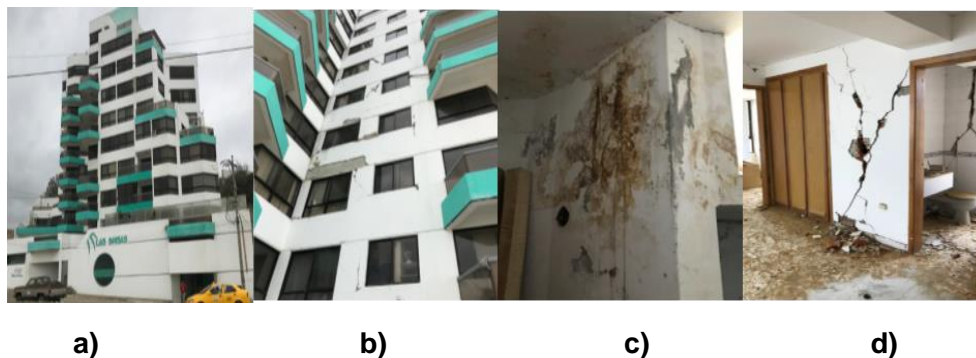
(a) The Brisas Building of 10 floors of reinforced concrete; (b) Lost of covering in some structural elements; (c) High corrosion index in girders; (d) Damages in masonry.
